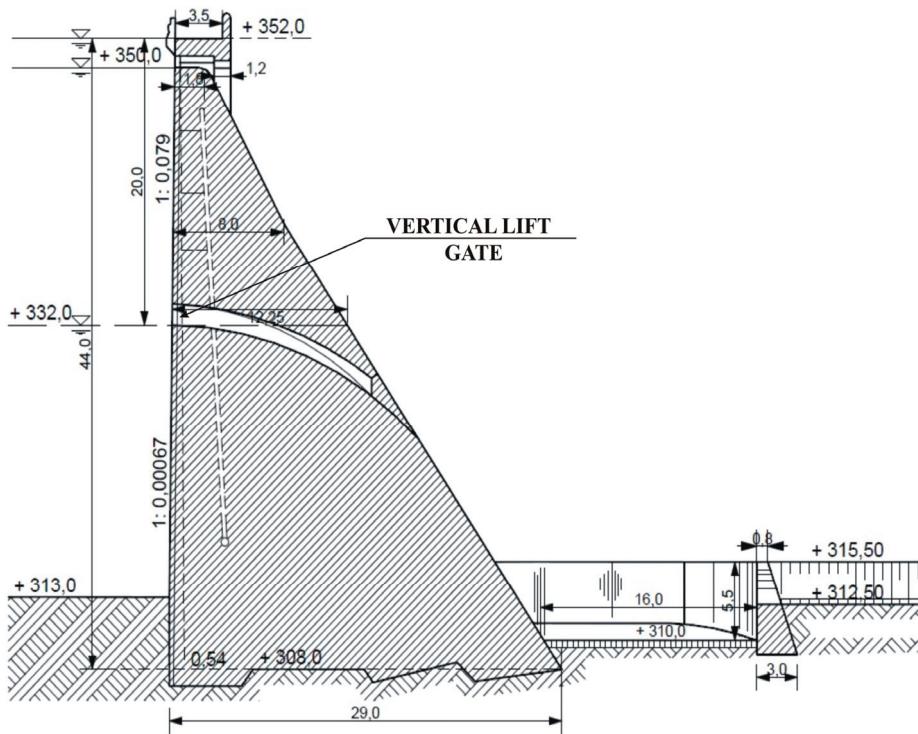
Cross-section of the Lubachów storage reservoir intermediate outlet
